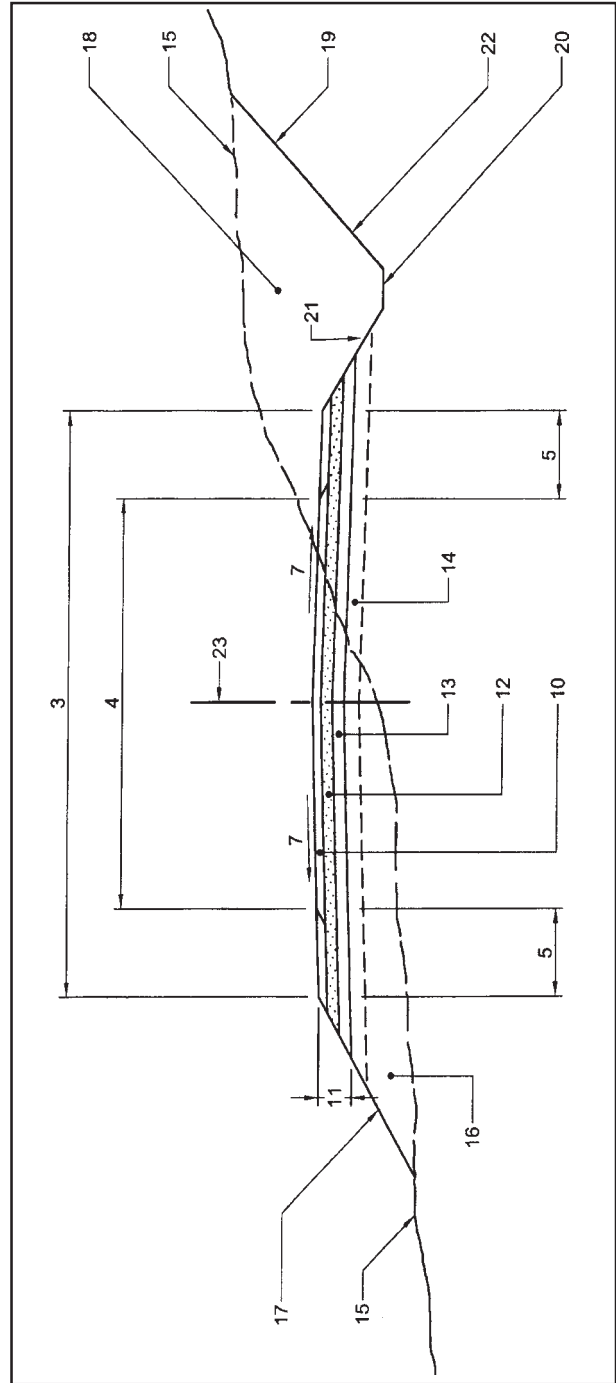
A2: TYPICAL CROSS SECTION OF A PAVED ROAD
